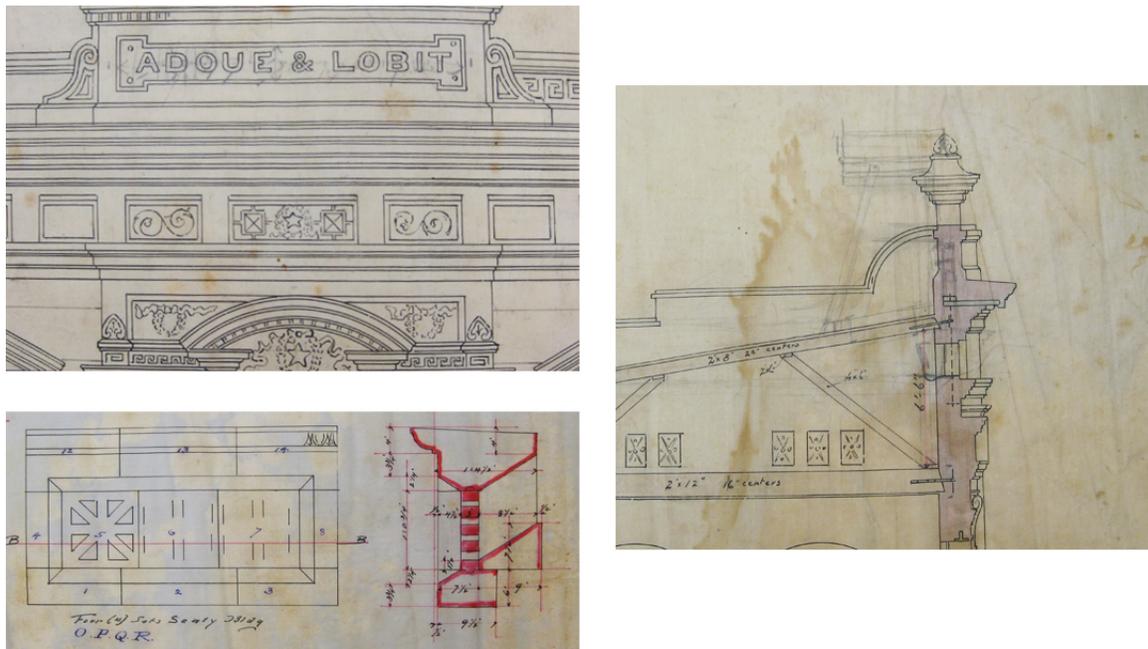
Venting blocks in Adoue & Lobit elevation (left top);
